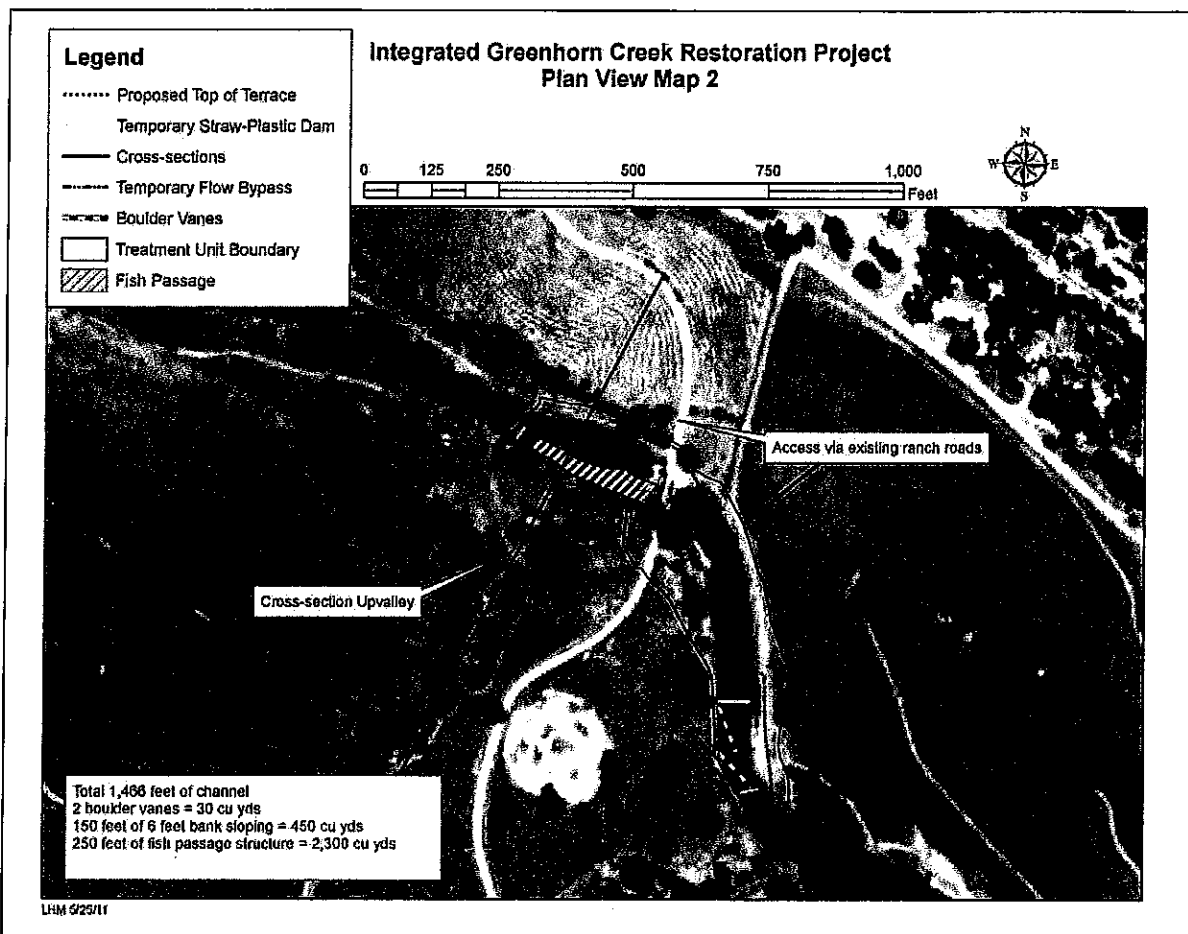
Plan View Map 2, Shea Dam Treatment Site.
